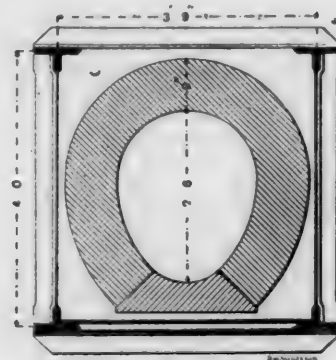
TRANSVERSE SECTION OF STEELWORK CARRYING SEWER UNDER DUMBARTON ROAD
